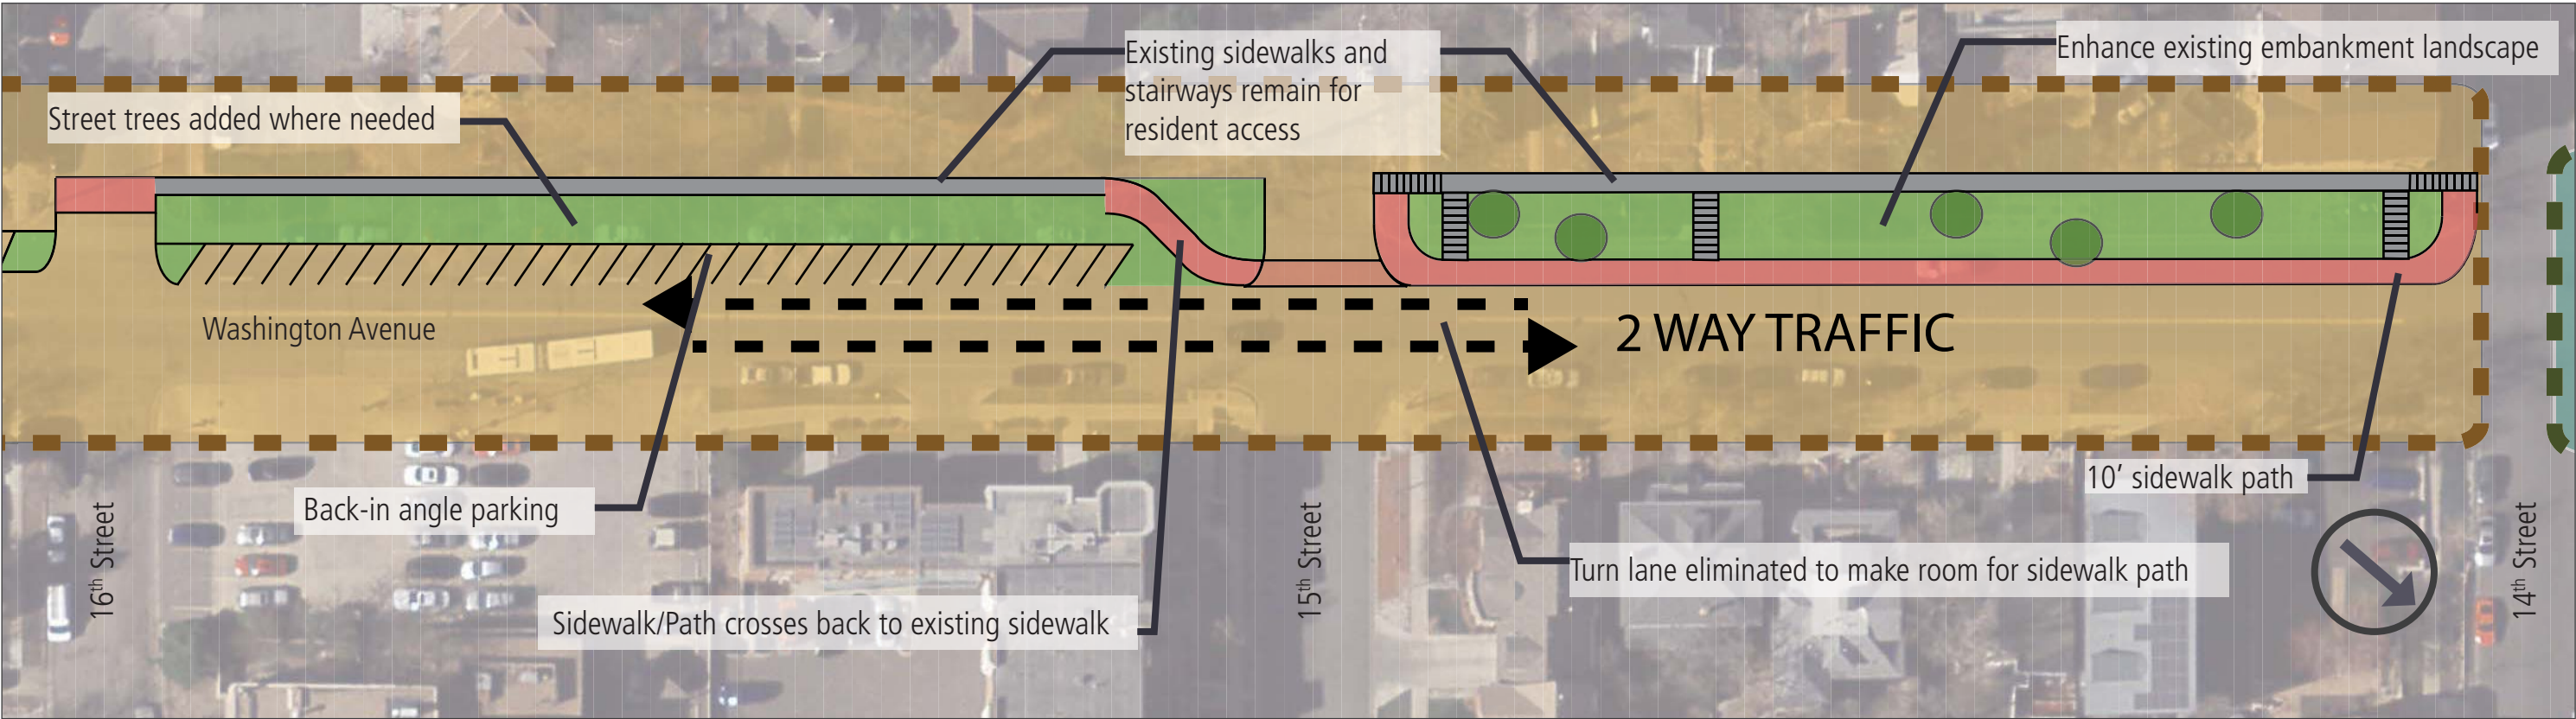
An idea for improving pedestrian access on Washington Avenue south of 14<sup>th</sup> Street
